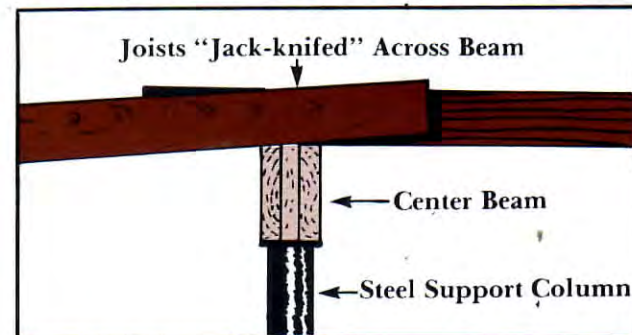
Jack-knifed joists, illustrated here, can cause humps in the middle of a house when foundation walls or piers under center beams settle.
